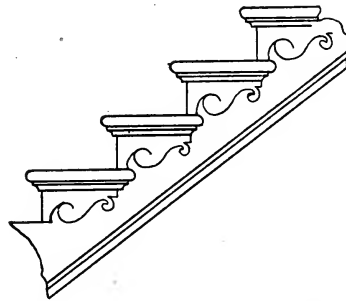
Portion of Open, Bracketed String Stair, with Returned Nosings and Coves, Scroll Brackets, and Bead Moulding.
